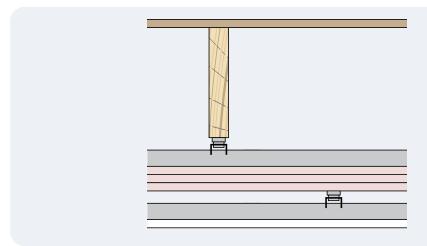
False ceiling detail for minimising service penetrations through ceiling systems.
